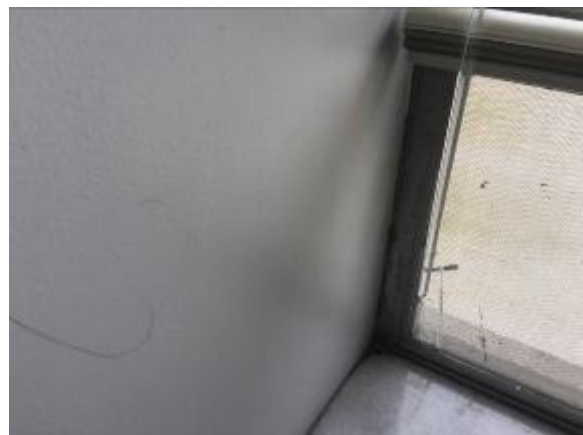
View of the flooring and wall board of the proposed hybrid operating room.
